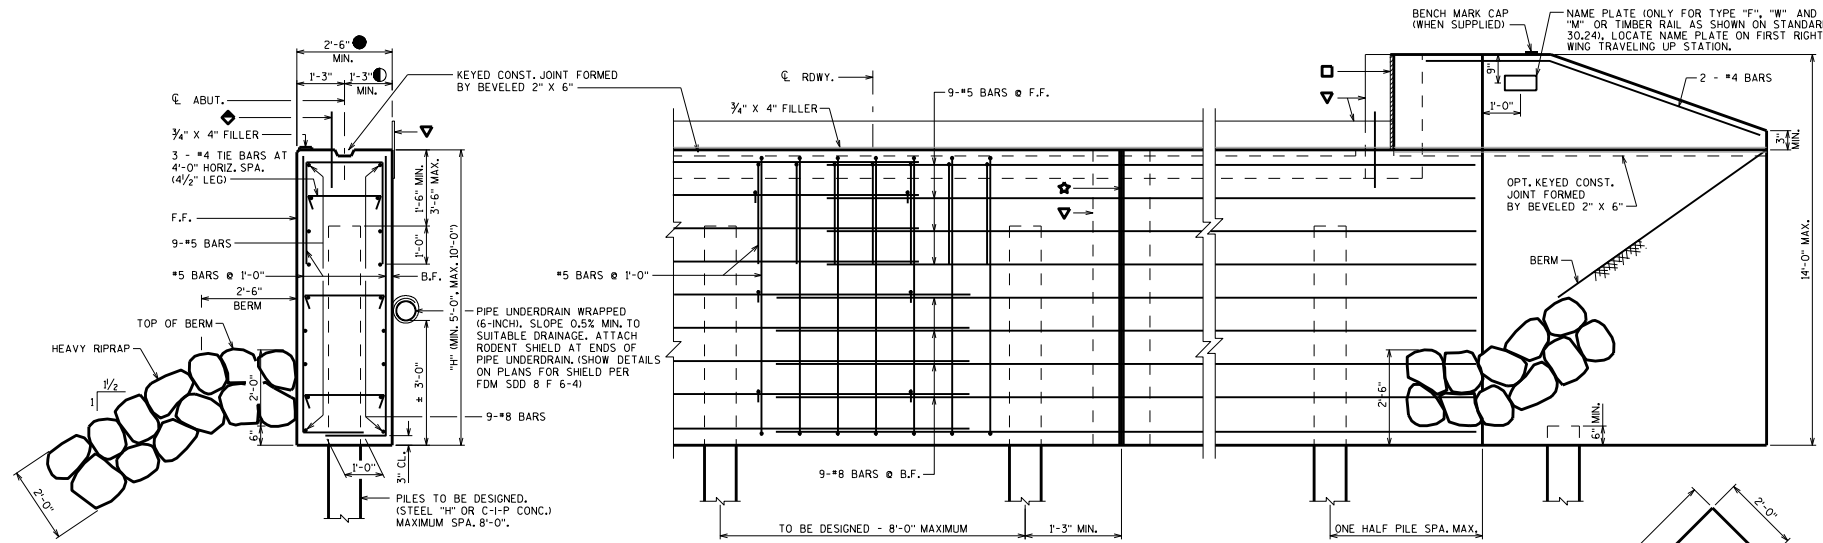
### DETAILS FOR WINGS PARALLEL TO A1 ABUTMENT CENTERLINE
